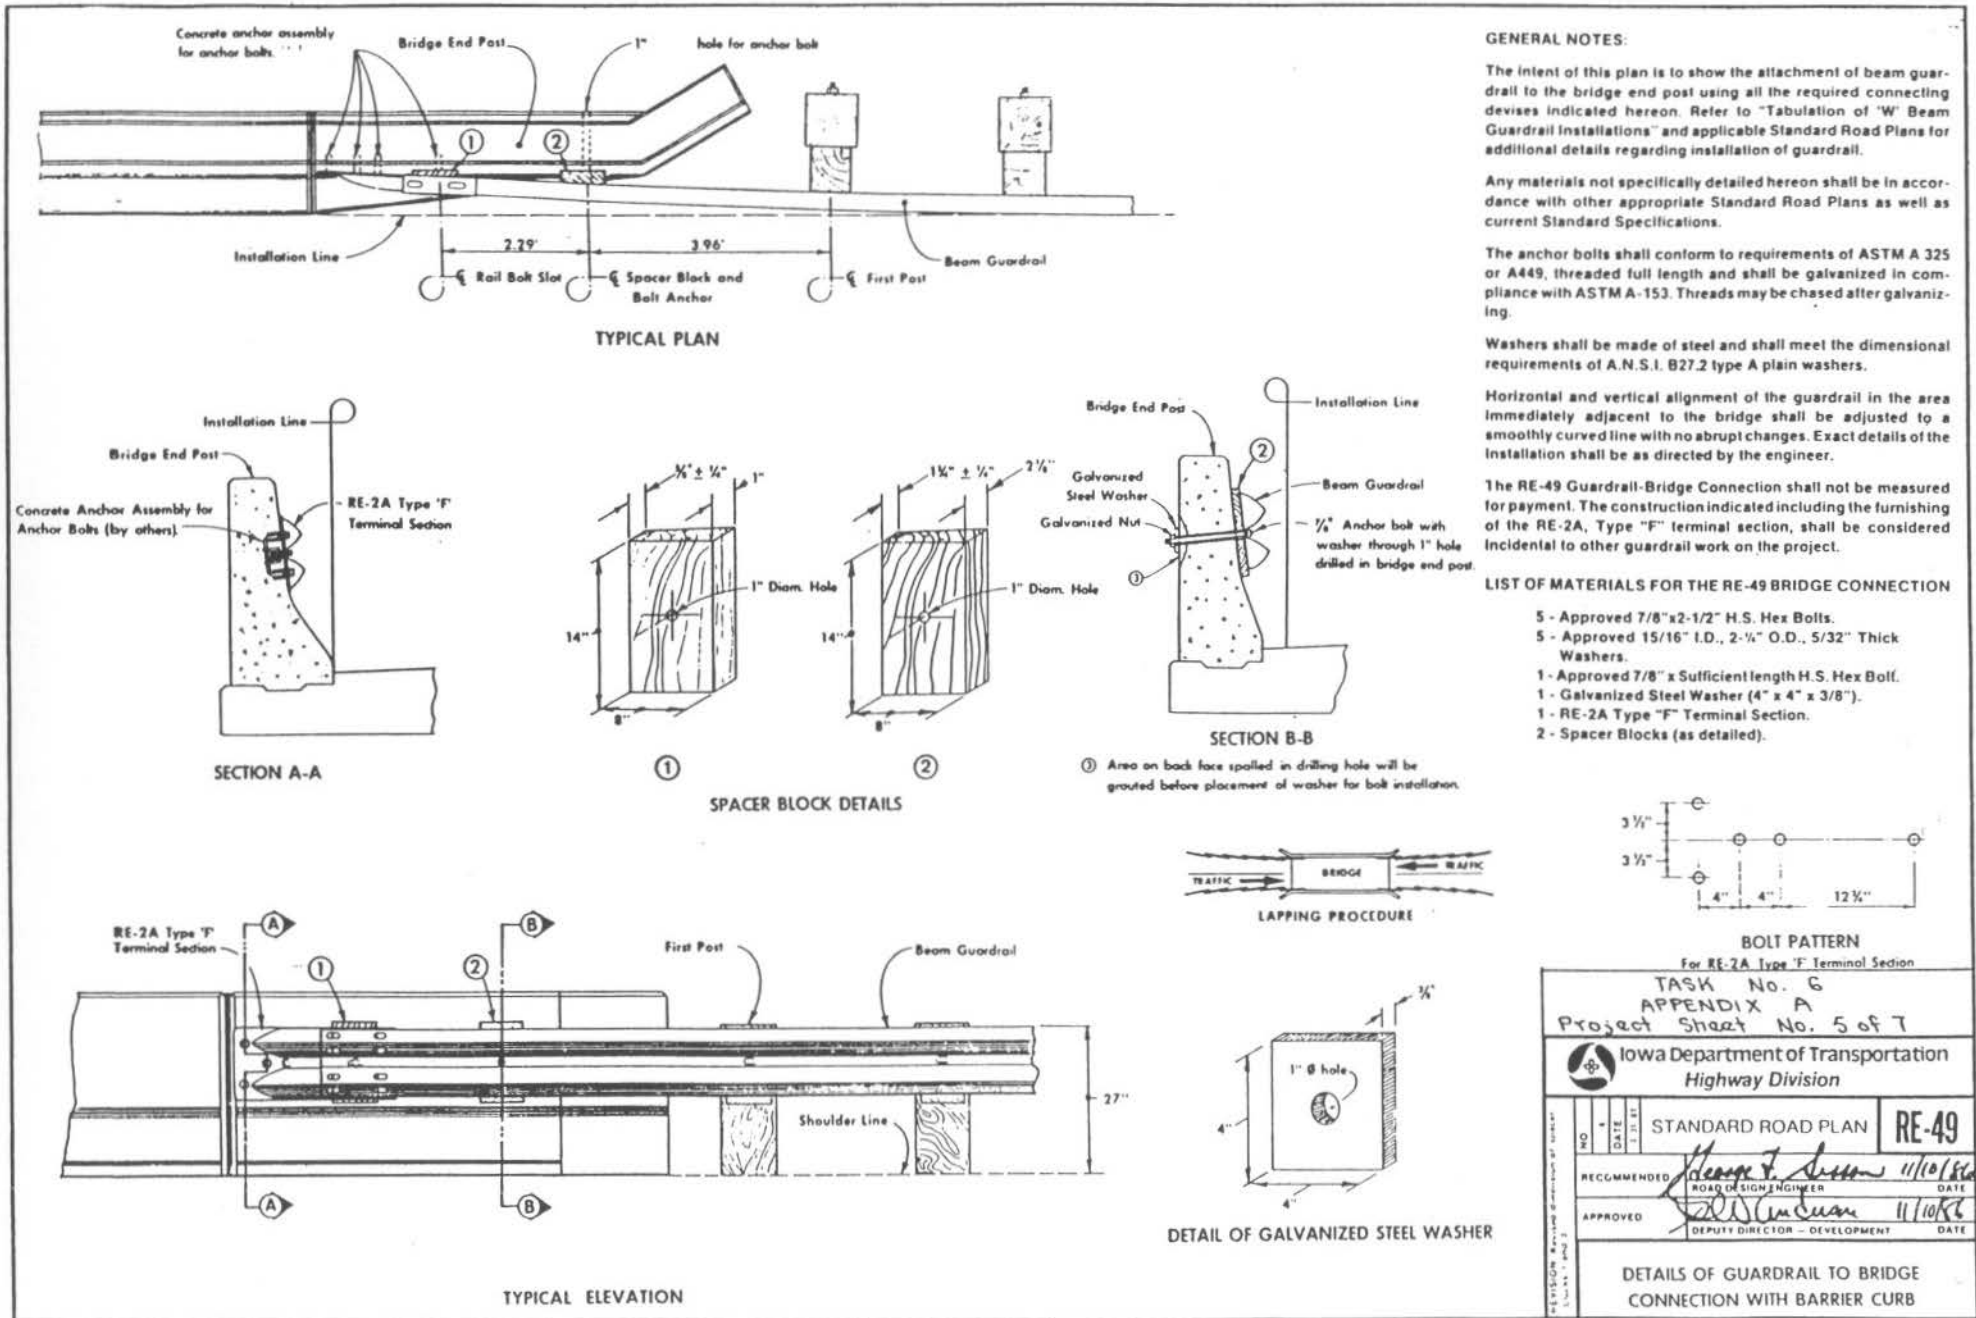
SKETCH OF W-BEAM TERMINAL CONNECTOR.
